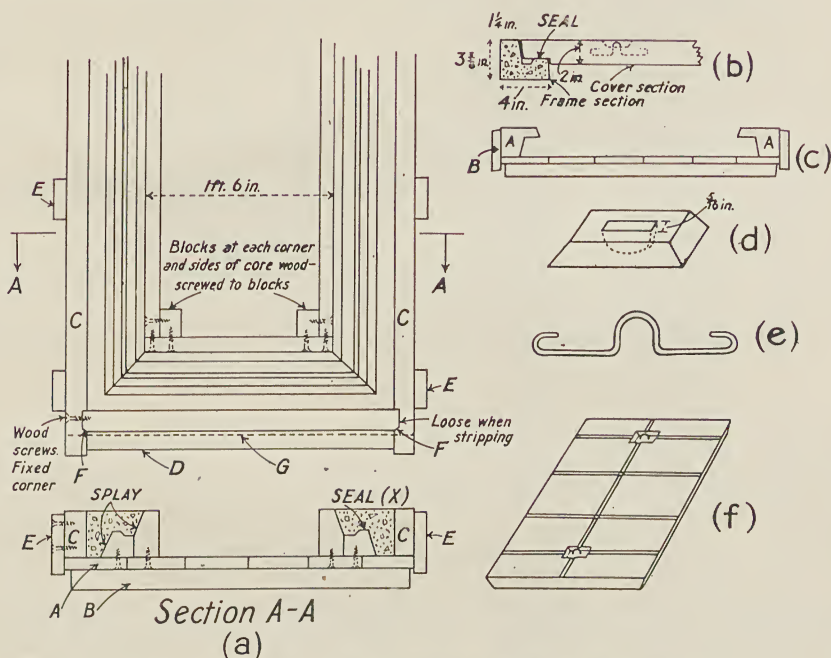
MOULD FOR MANHOLE FRAME AND COVER.
